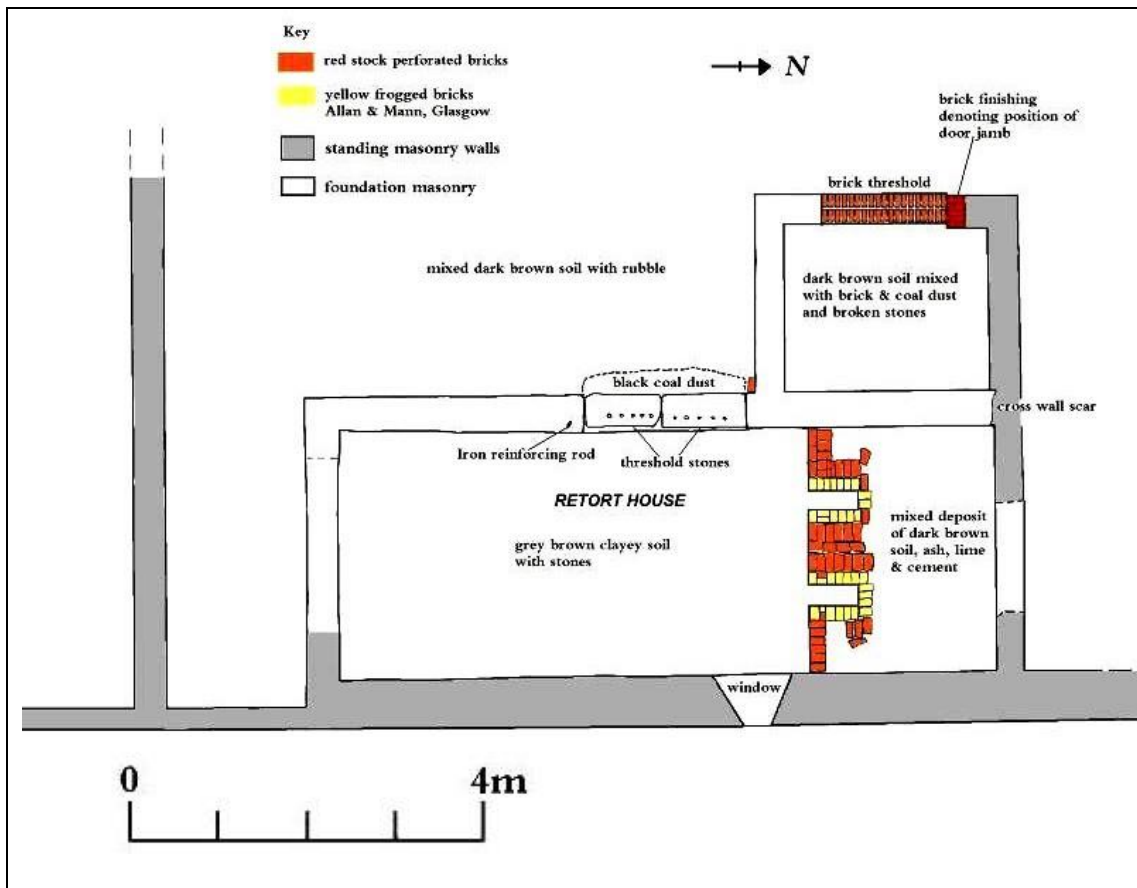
Plan of Gas House, March 2011. (Drawing by Malachy Conway)
